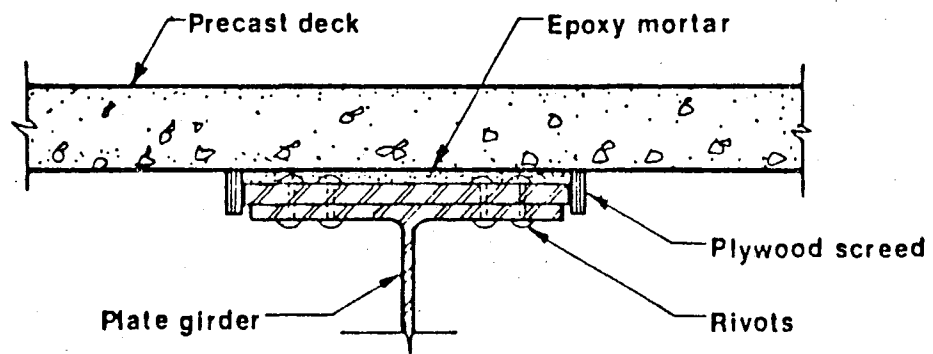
Connection Detail, Santa Fe Railroad Bridges. (9)
